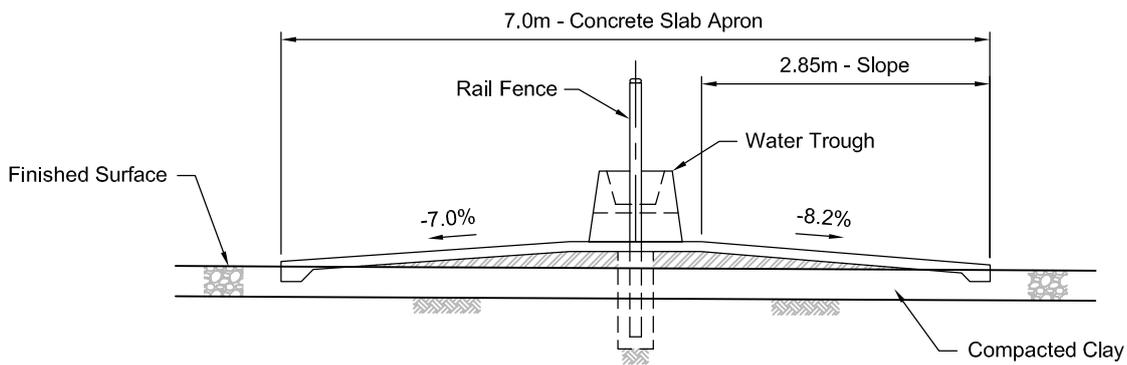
Typical concrete apron cross section details with apron graded down on upslope side
